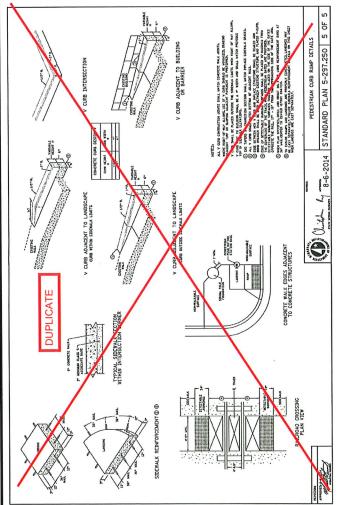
# DETAIL PLATES KASSON, MINNESOTA WEADOWBROOKE SECOND SUBDIVISION
